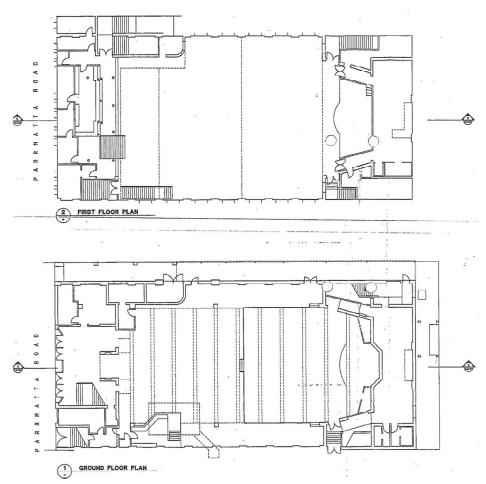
Homebush Theatre, showing the First Floor Plan and Ground Floor Plan - Oretone Development prepared by JTCW Architects –July 2003 (Source: archives held by caretaker of Homebush Theatre)
